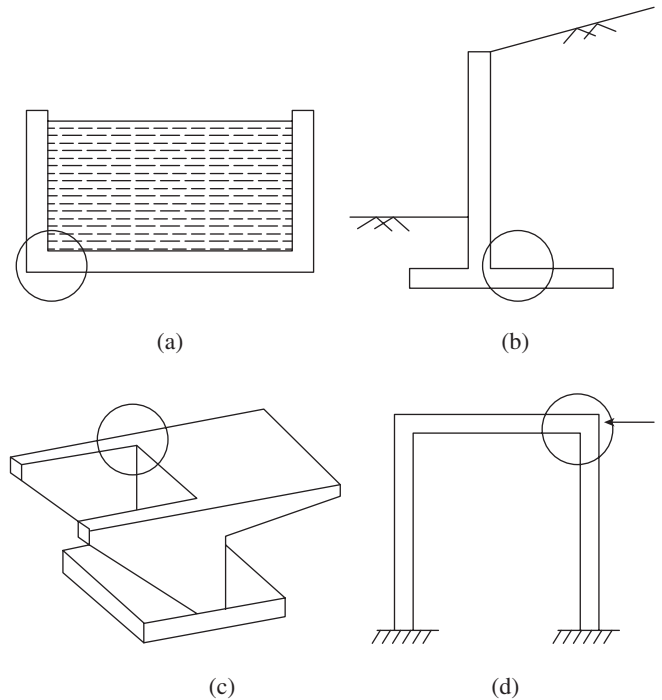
Examples of opening joints (a) Water tank (b) Retaining wall (c) Bridge abutment (d) Portal frame
